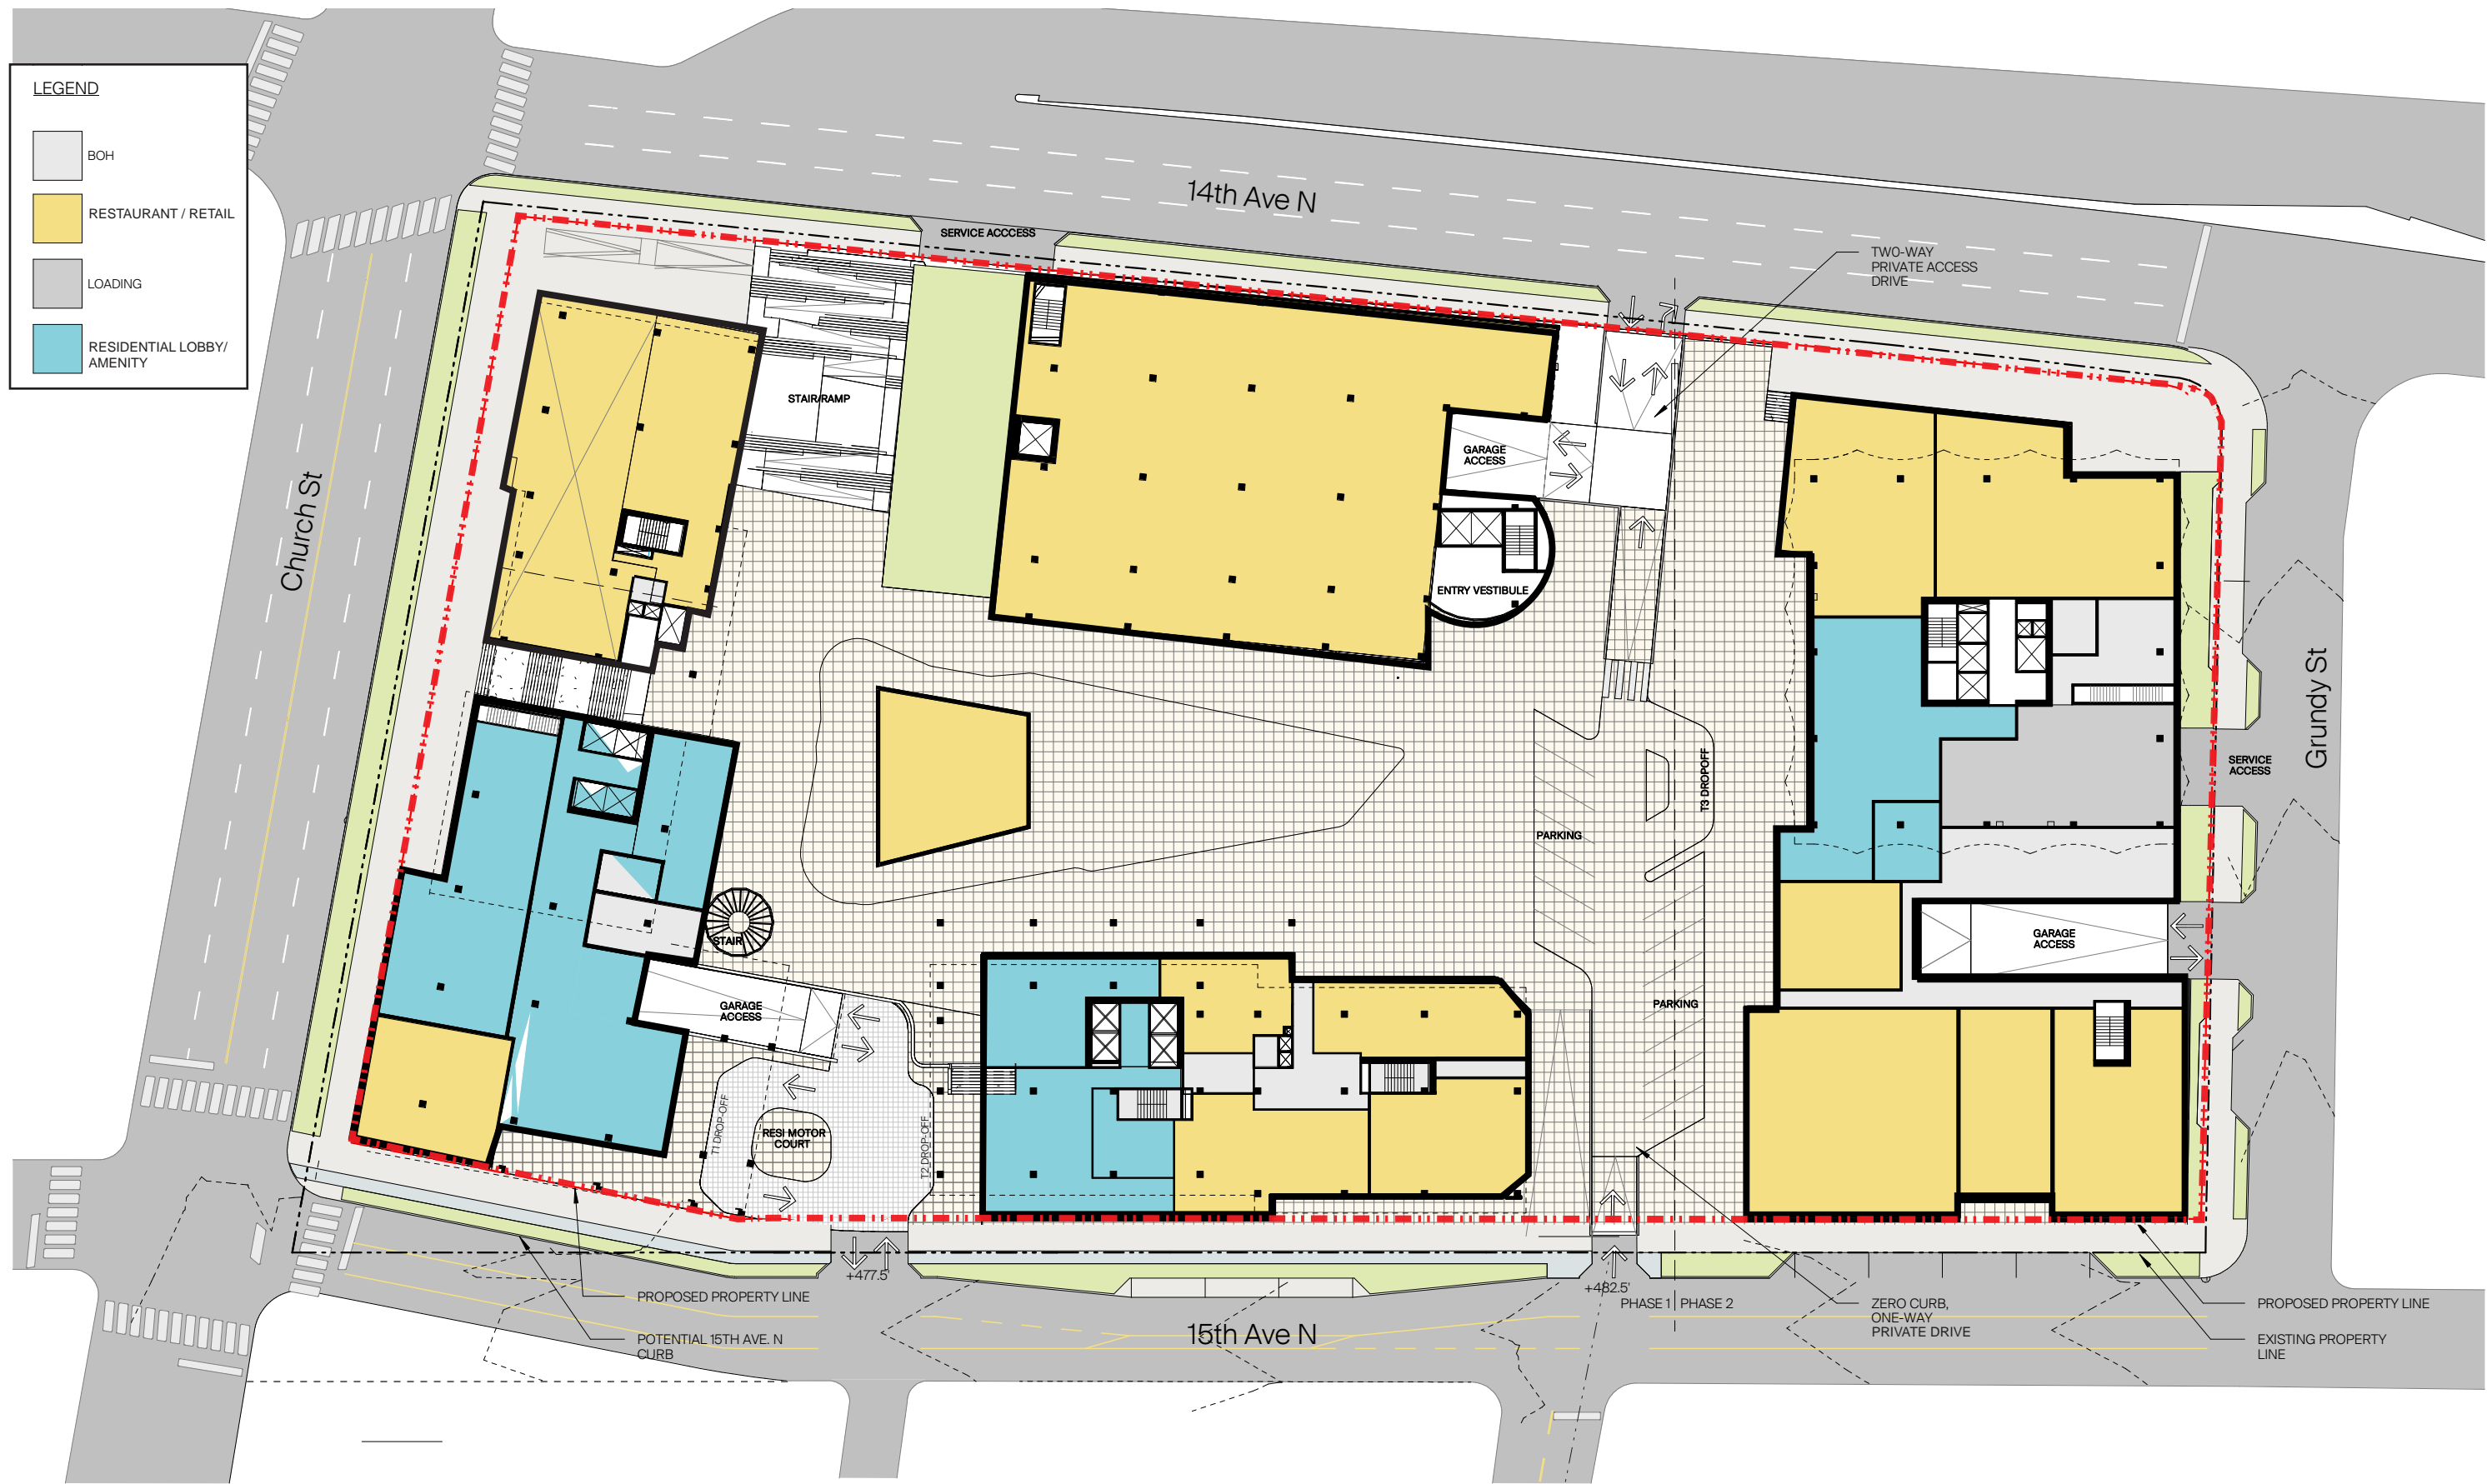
| PLAZA LEVEL FLOOR PLAN
